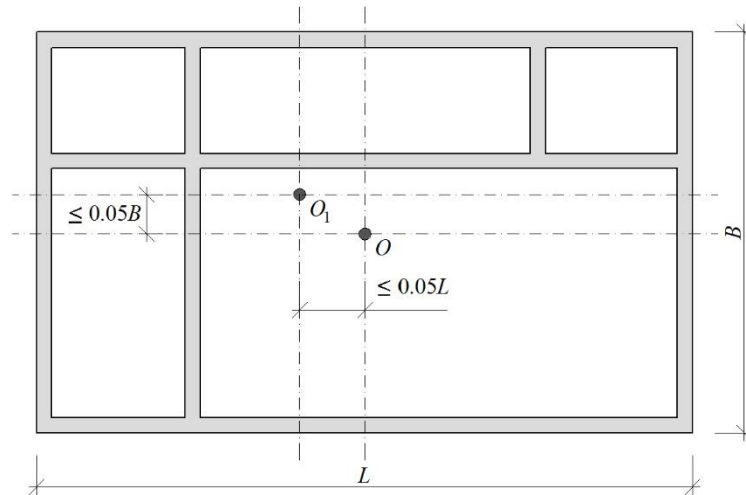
The principle of the layout of stiffening walls:  $O$  – the geometrical center of the building plan,  $O_1$  – the geometrical center of the stiffening wall plan
